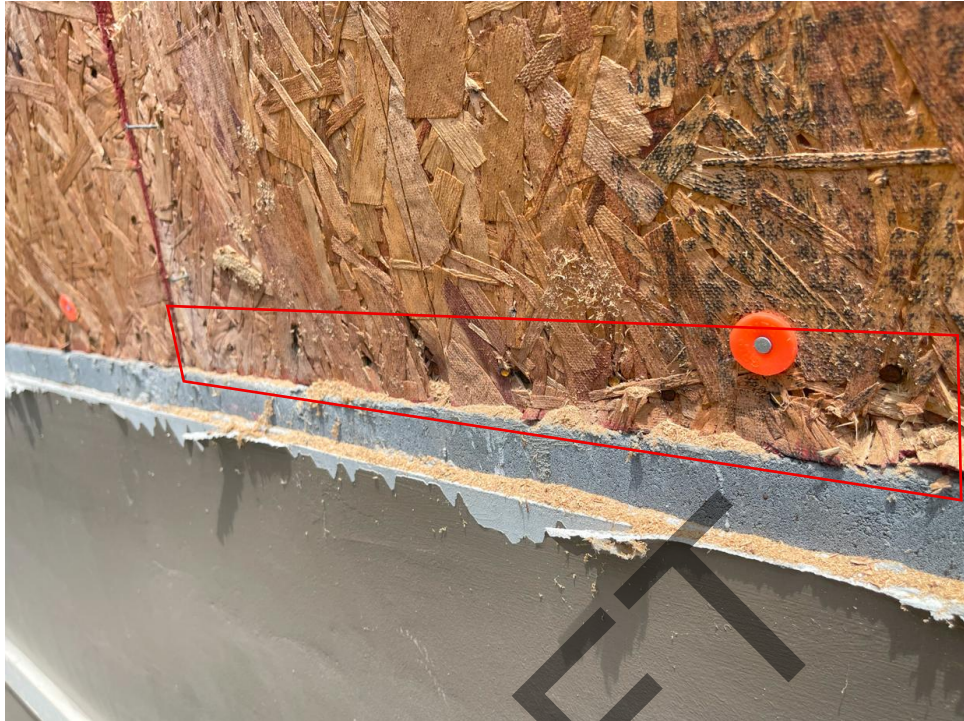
View of warped oriented strand board (OSB) sheathing along the west elevation of Building K.
